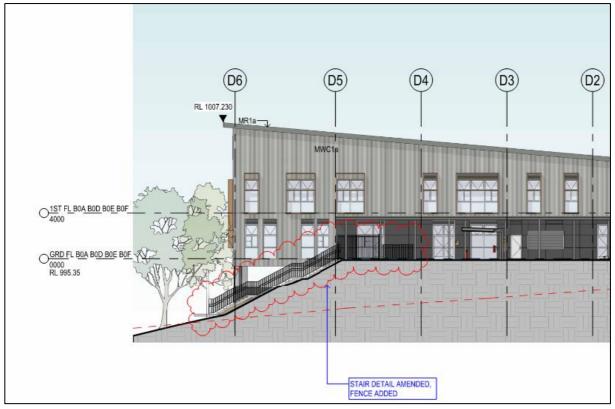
NORTHERN ELEVATION OF BLOCK D
